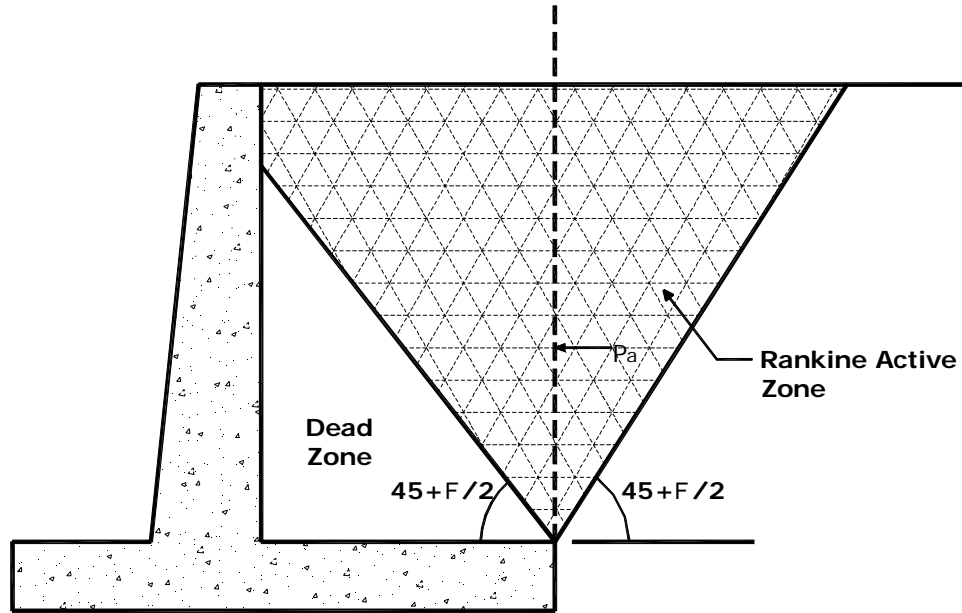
Failure of sand behind a cantilever retaining wall
